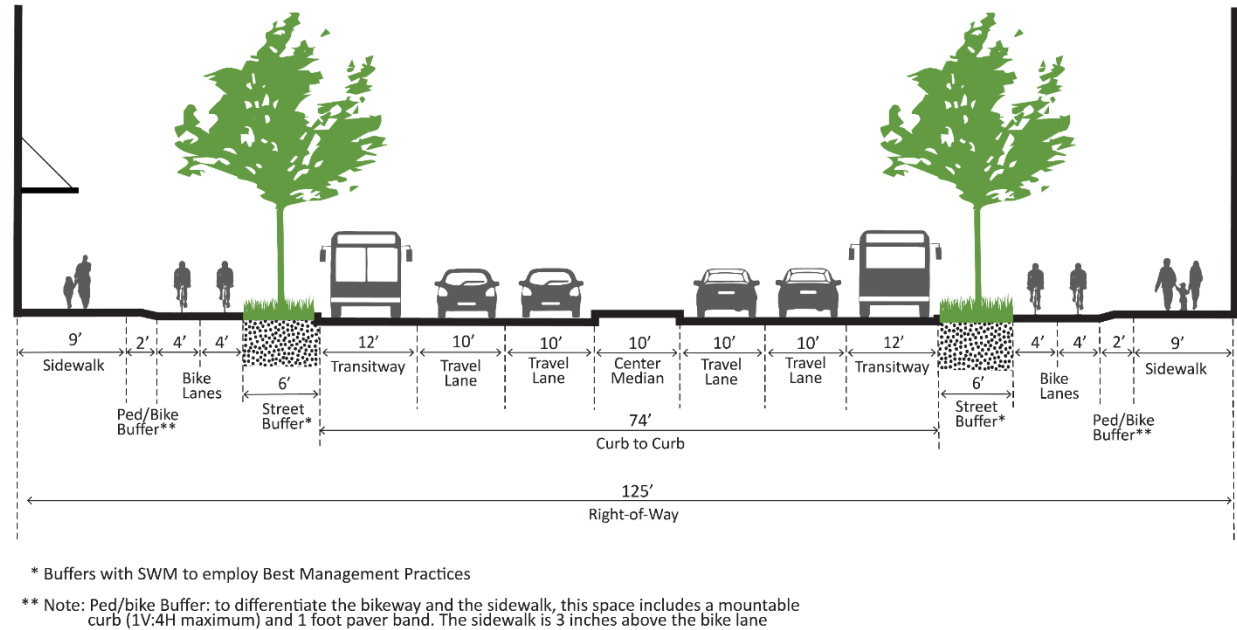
Colesville Road (M-20): East-West Highway to 16th Street, Looking North
